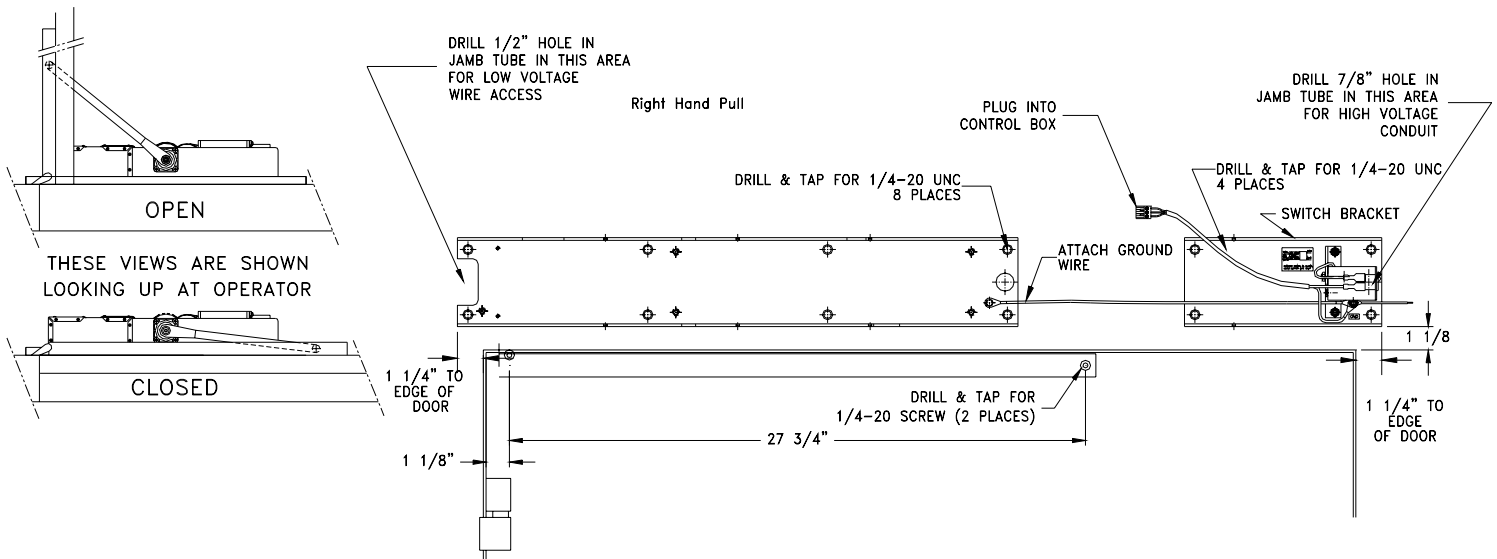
OPERATOR CLEARANCES – PULL ARM
